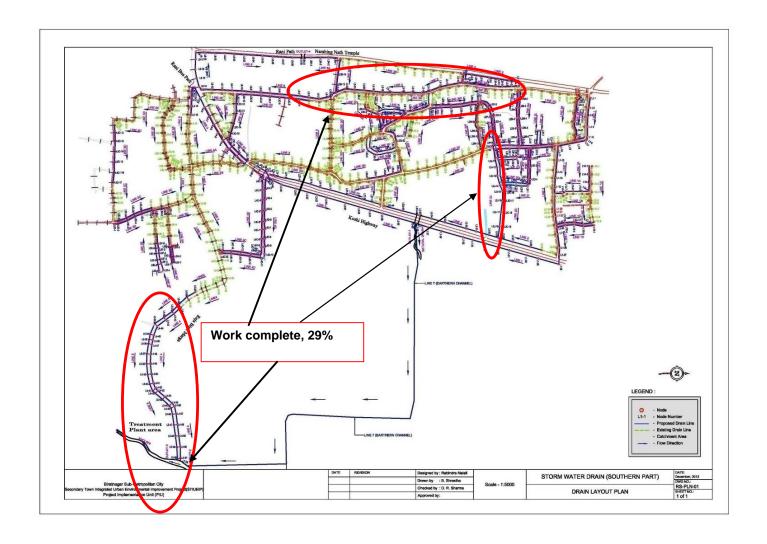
Proposed Storm Water Drains in BSMC (Southern Drainage System)
